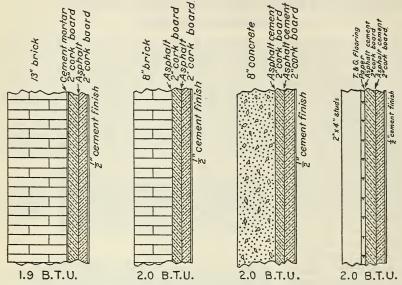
Typical wall construction for cold-storage rooms, and the coefficient of heat transfer in British thermal units
